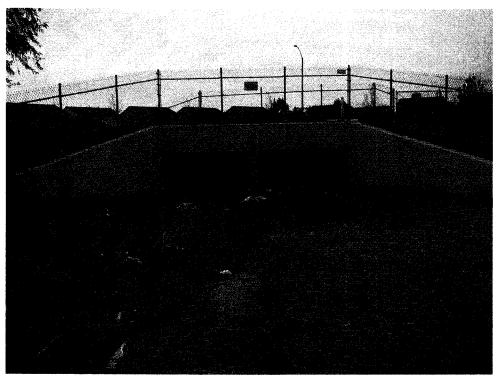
A – Easterly view of proposed project connection to existing upstream portion of Line J westerly of Pats Ranch Road
